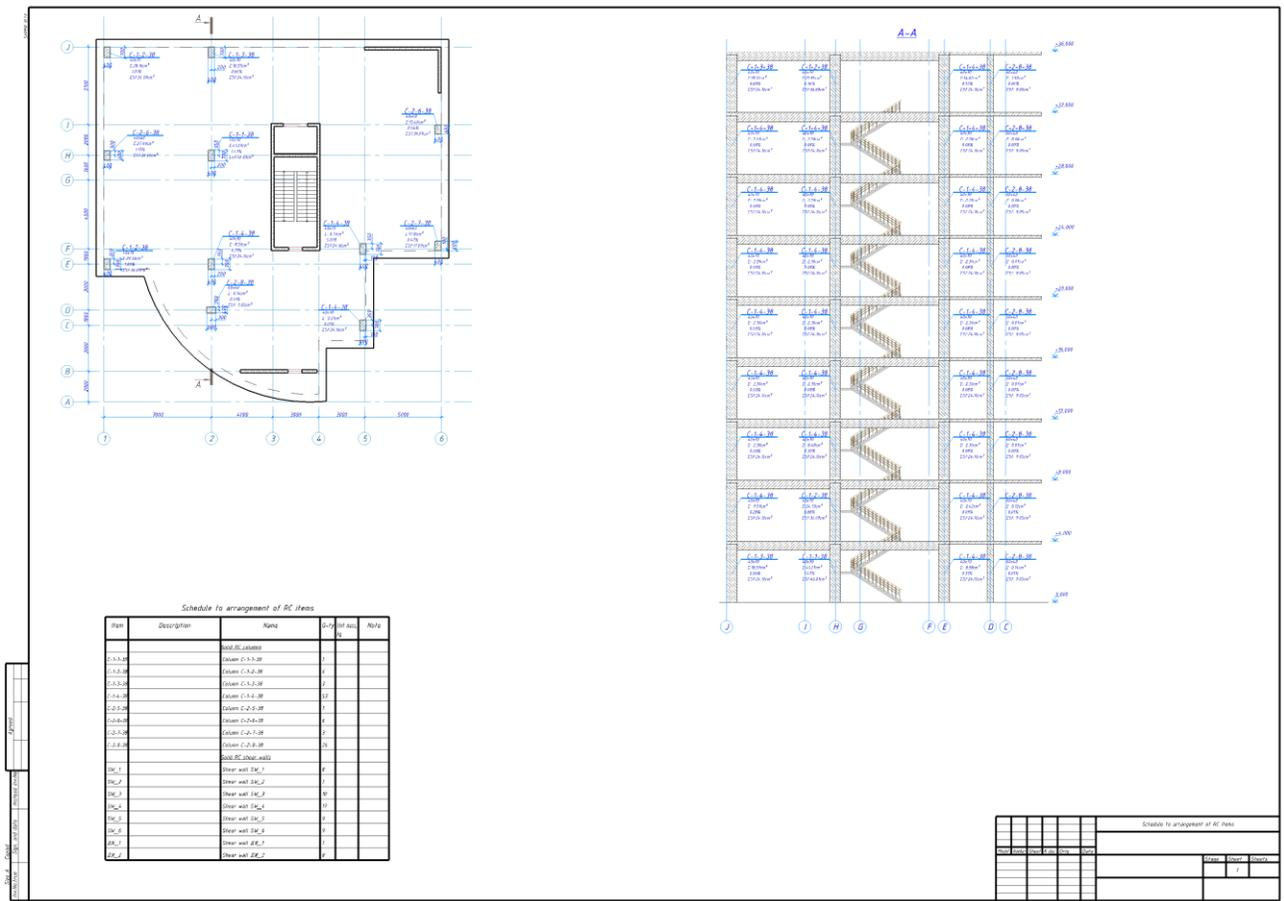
Sheet of drawing that contains plan and section view with tags as well as schedule
